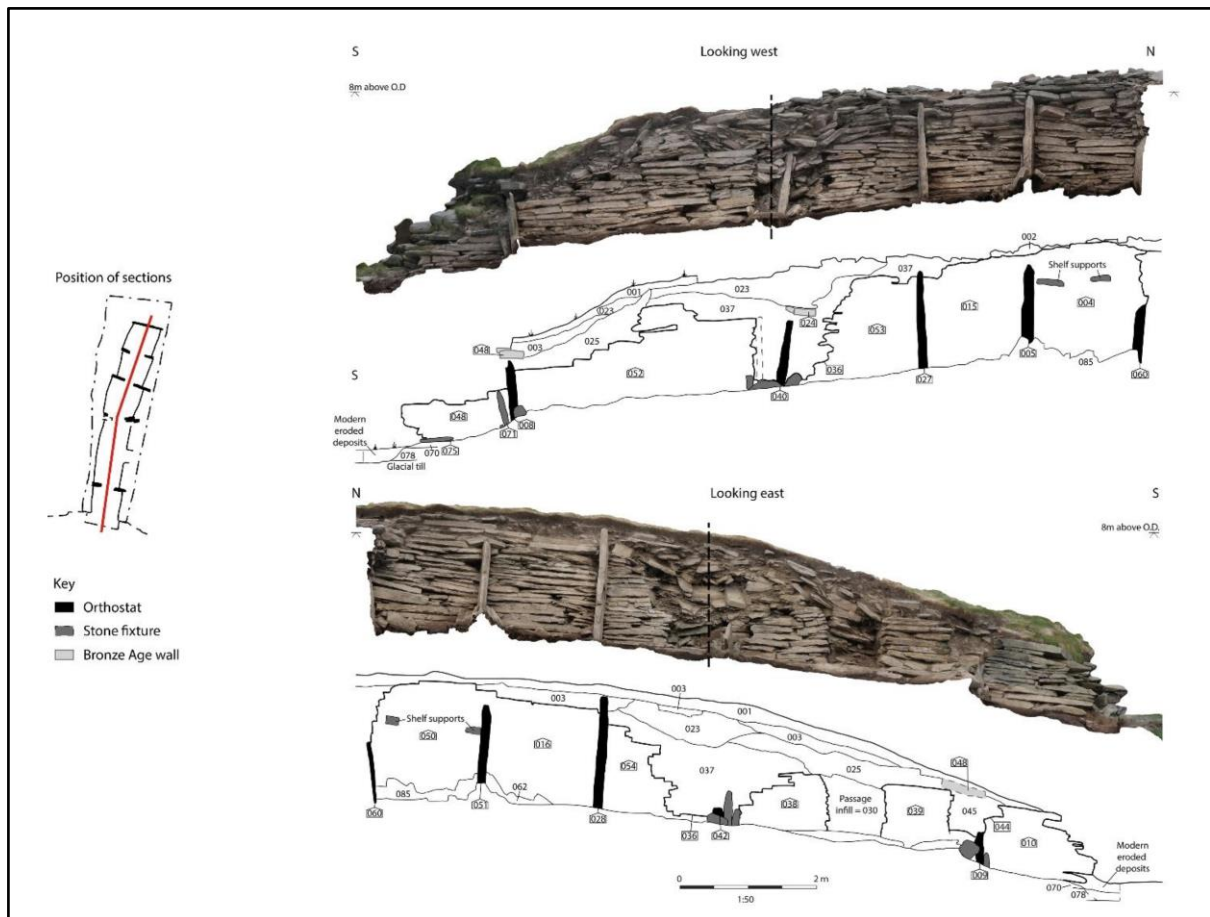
East and west elevations and sections of Tresness showing the disturbance in the architectural fabric of the drystone walling (Anderson-Whymark and Cummings 2021, figure 4)
